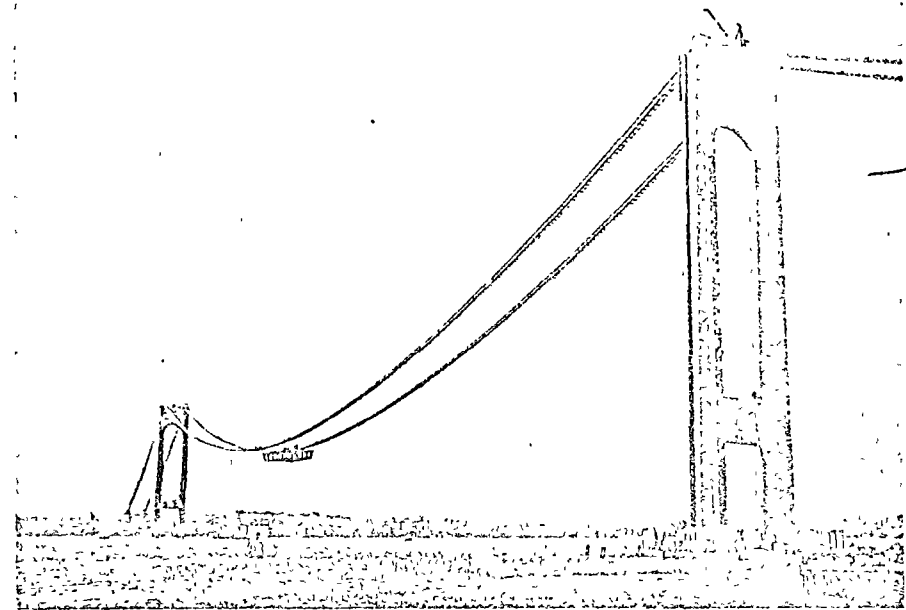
Verrazano Narrows Bridge Under Construction (Courtesy of Triborough Bridge and Tunnel Authority)
